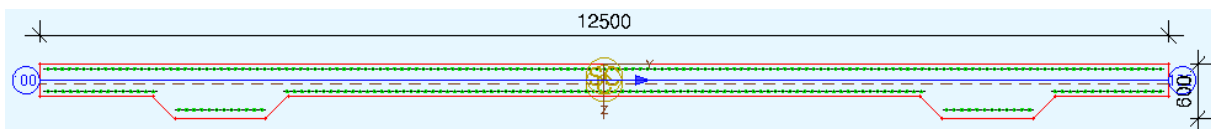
Programmed cross-section with tensile reinforcement, steel-box variant
